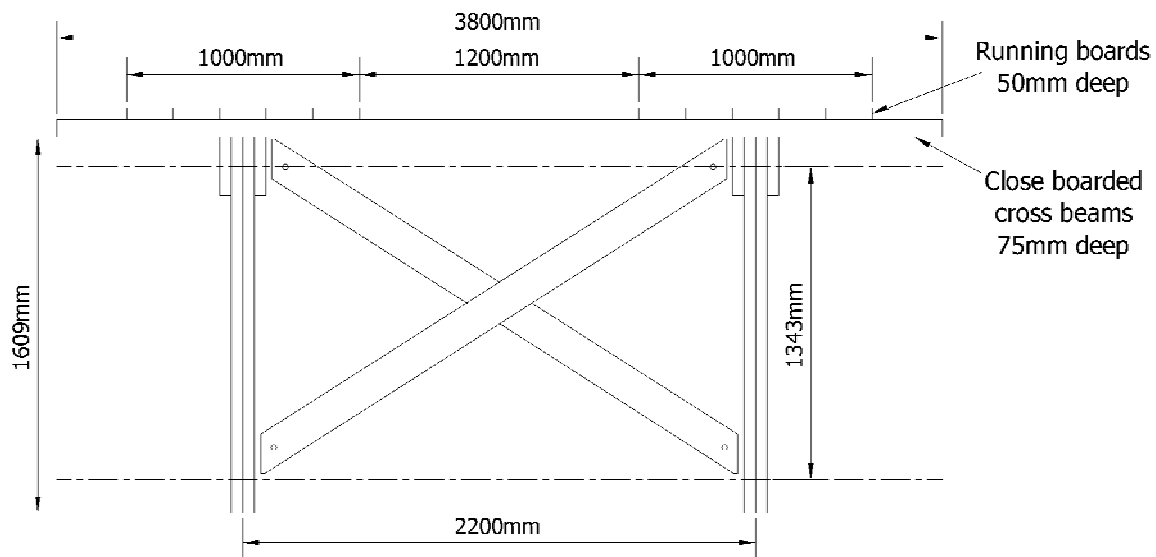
Cross-section of 2-truss Kenyan Truss bridge
